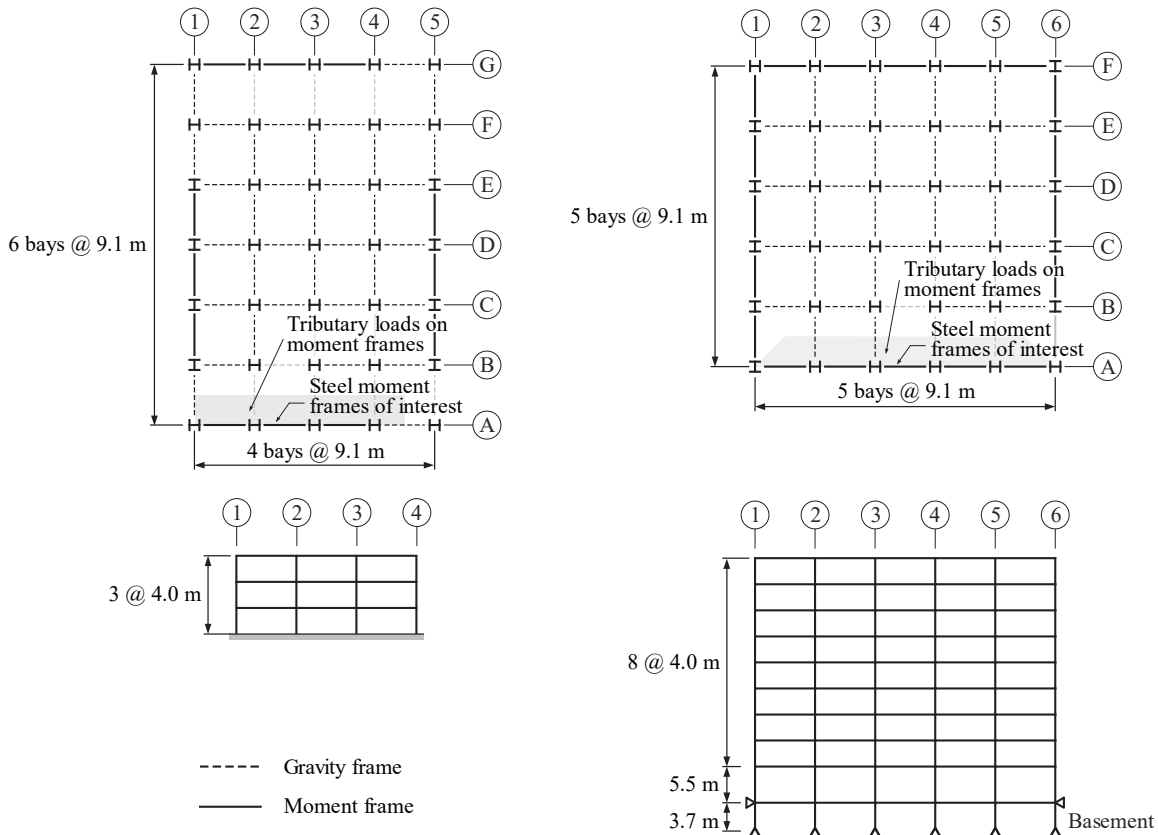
Plan views and elevation layouts of the story steel frame buildings
